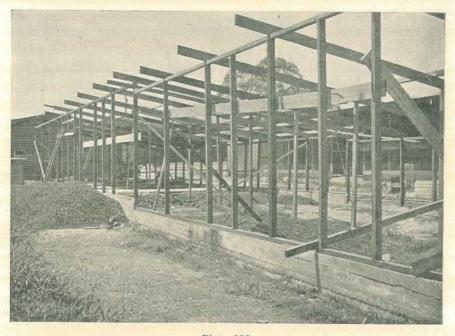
INTENSIVE POULTRY HOUSE IN COURSE OF CONSTRUCTION.—Note concrete baffle wall to keep rats from under the floor.
